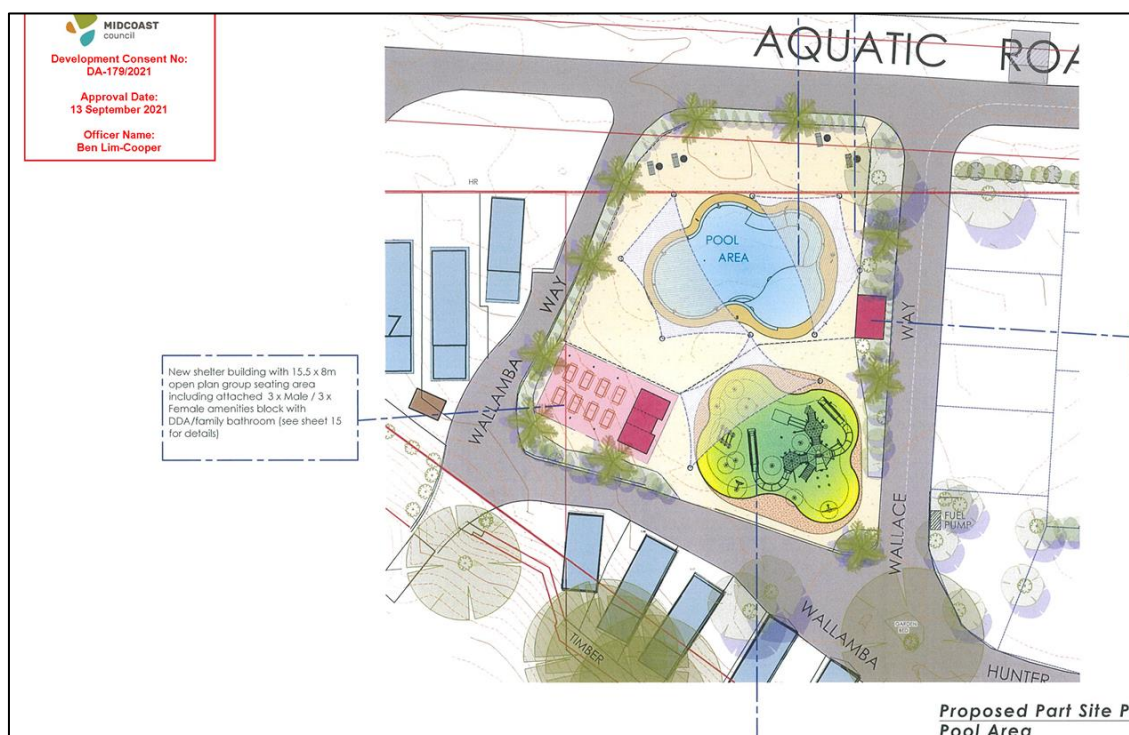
Stamped approved plans approved Subject to DA 179/2021 depicting a new barbeque shelter & bathroom amenities within the swimming precinct [source: Discovery Park]
